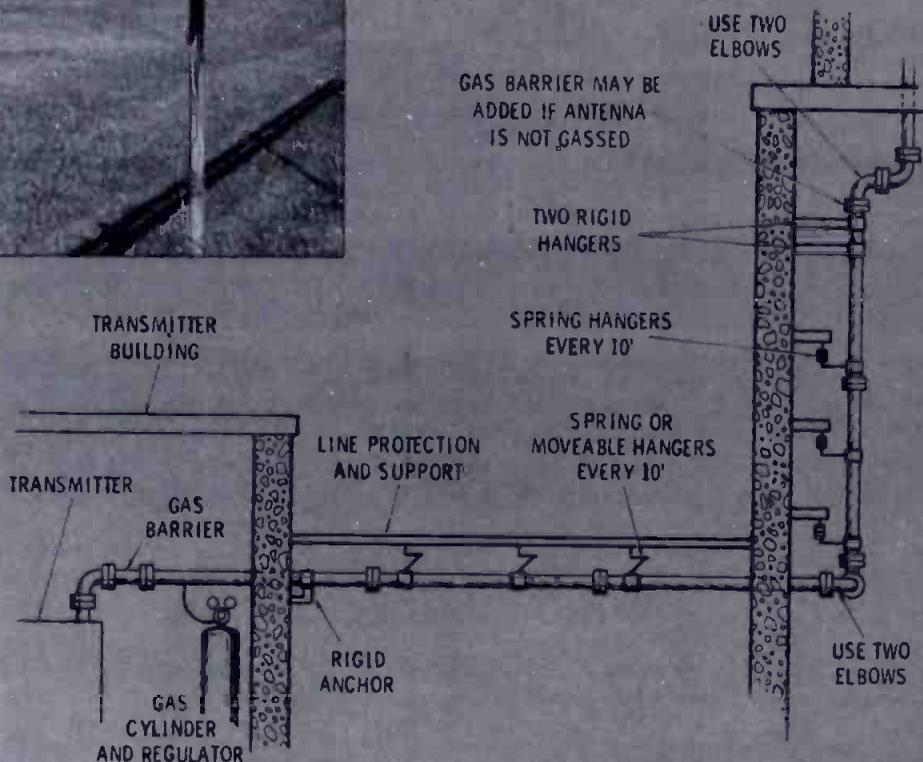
Typical rigid line installation plan. It need not be to scale, but all necessary items should be shown and their positions in line.
